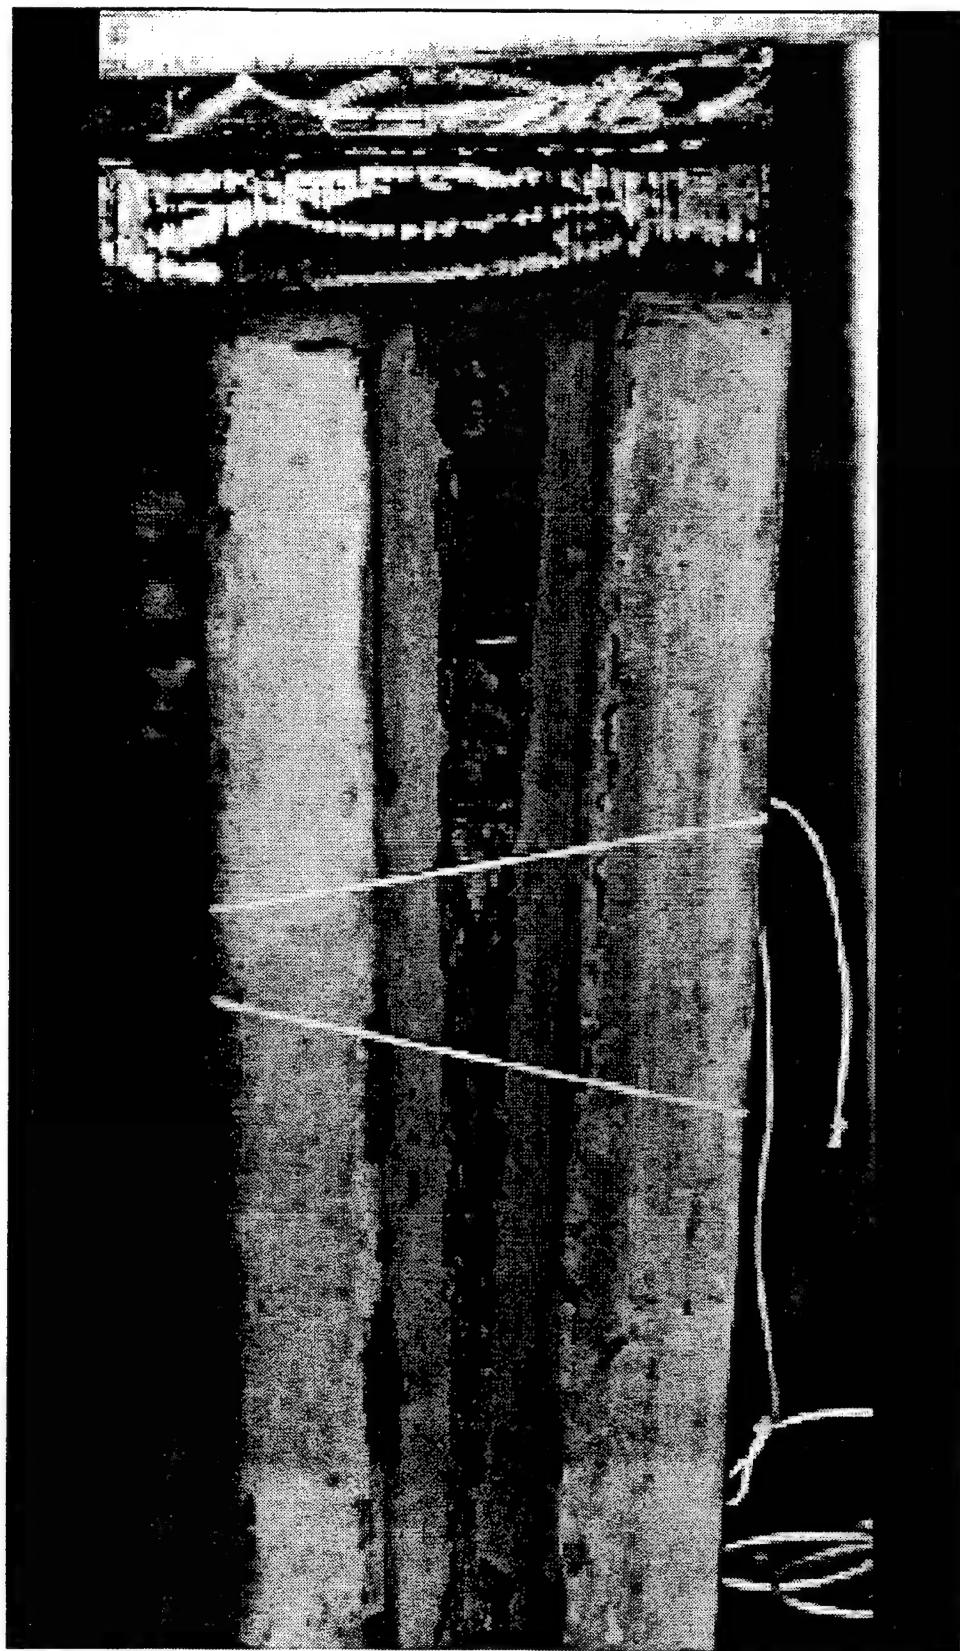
Shearing a concrete specimen to produce a delamination evaluation model
